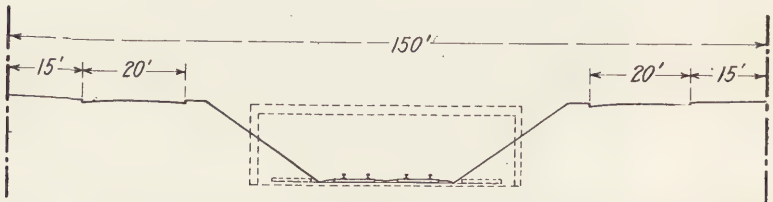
Showing a double-track rapid-transit railroad with side slopes in a street 150 ft. wide, with a view to converting it into a four-track, underground road, when necessary.
